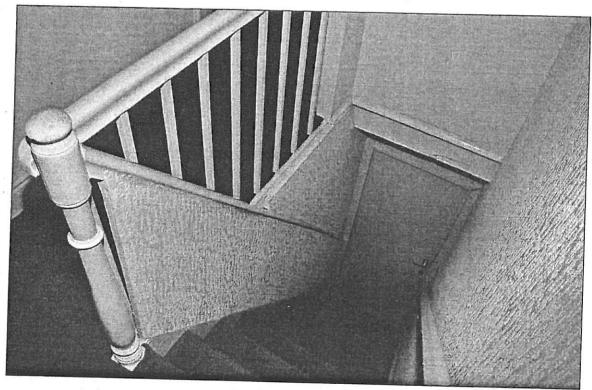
View down staircase to ground floor. Original newel post; original balustrade concealed.
